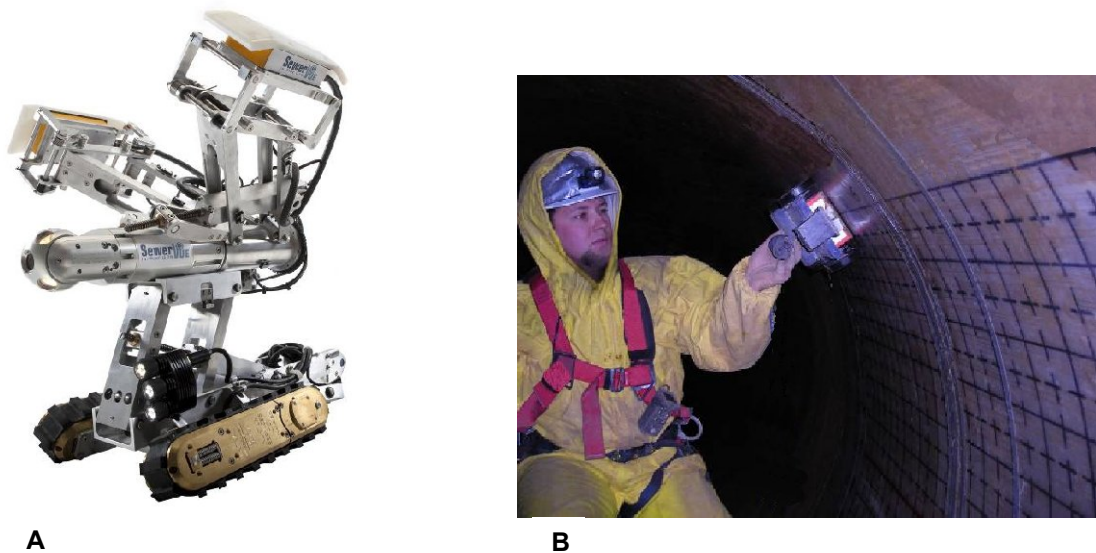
A: “SewerVUE Surveyor” multi-sensor inspection robot equipped with PTZ CCTV, and pipe penetrating radar. B: technician performing PPR scanning in a 60” (1800 mm) reinforced concrete water pipe.
